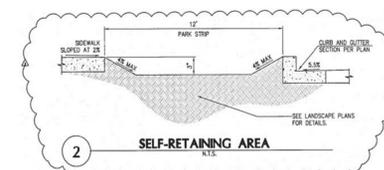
Example Self-Retaining Landscaped Area Cross Section
